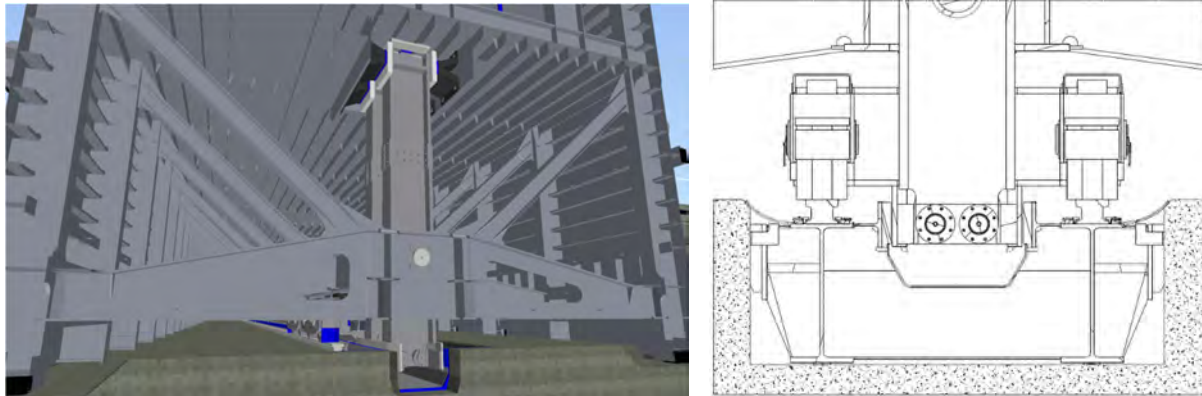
Cross section of horizontal guidance structure and rail beam structure
